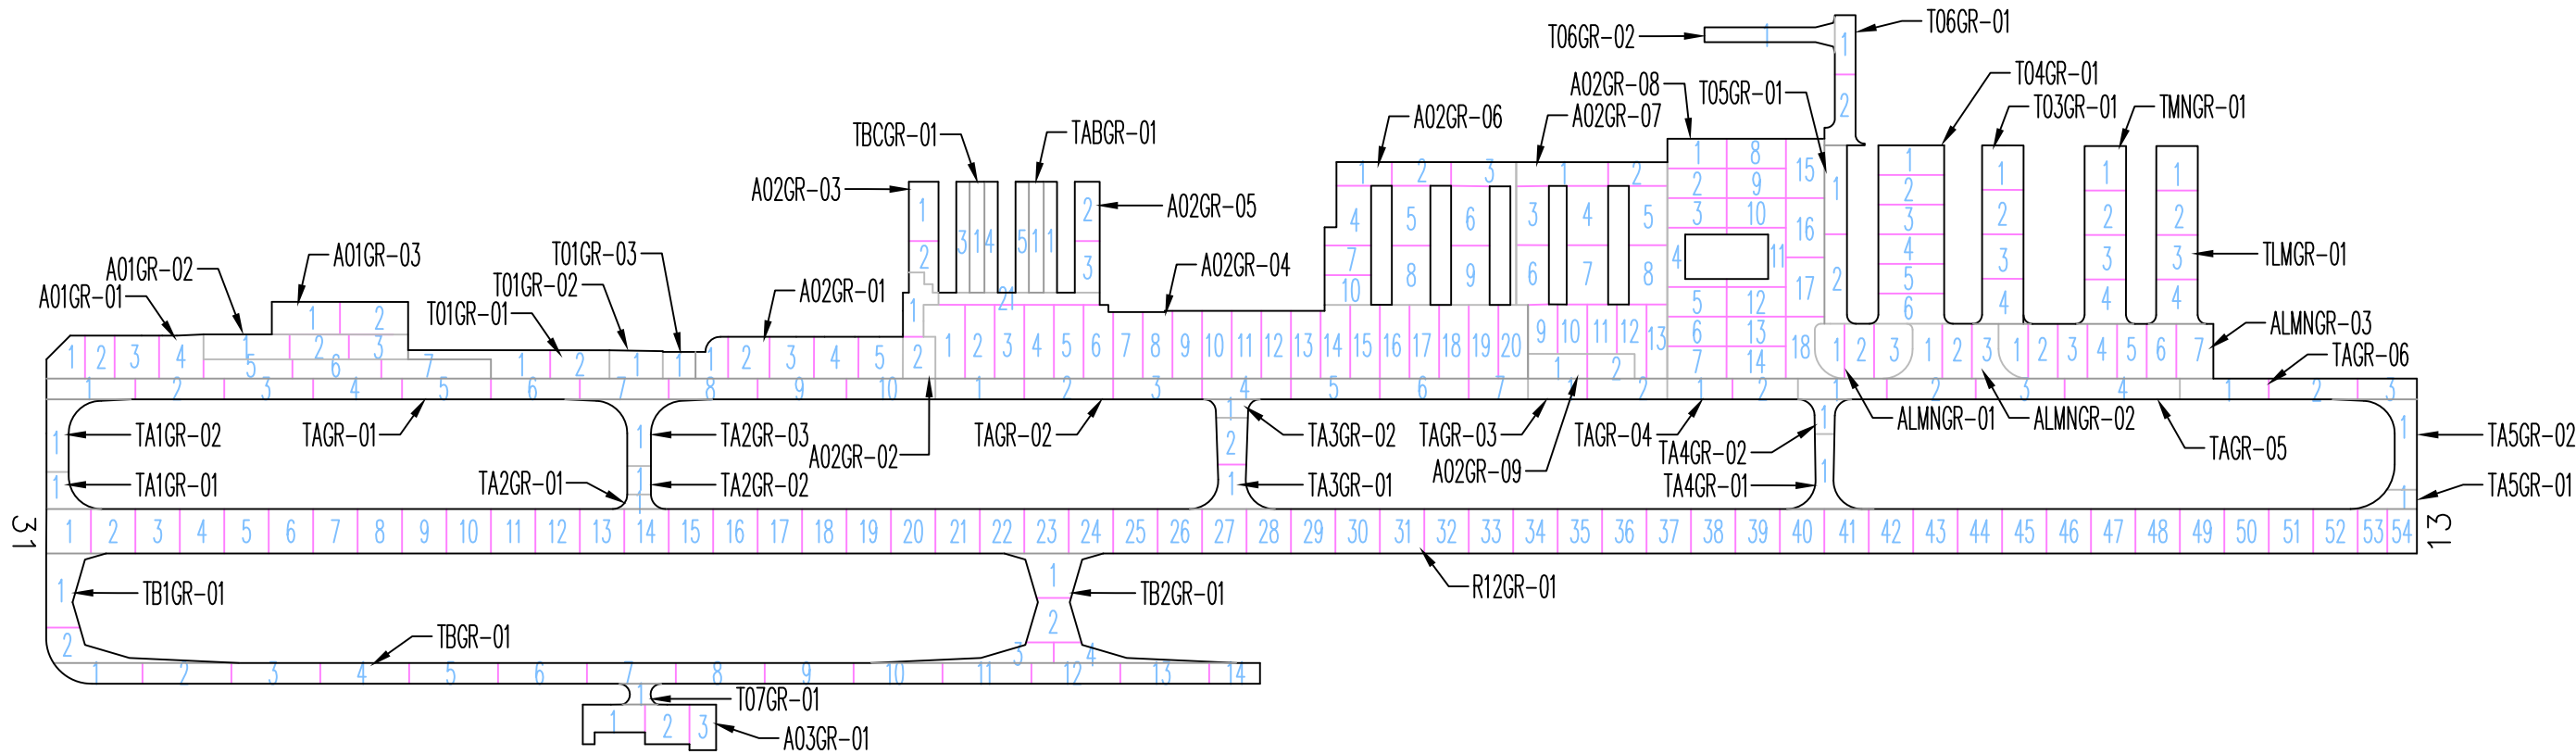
B. Airport Layout, Dimensions and Pavement Cross-Sections – Aprons.
